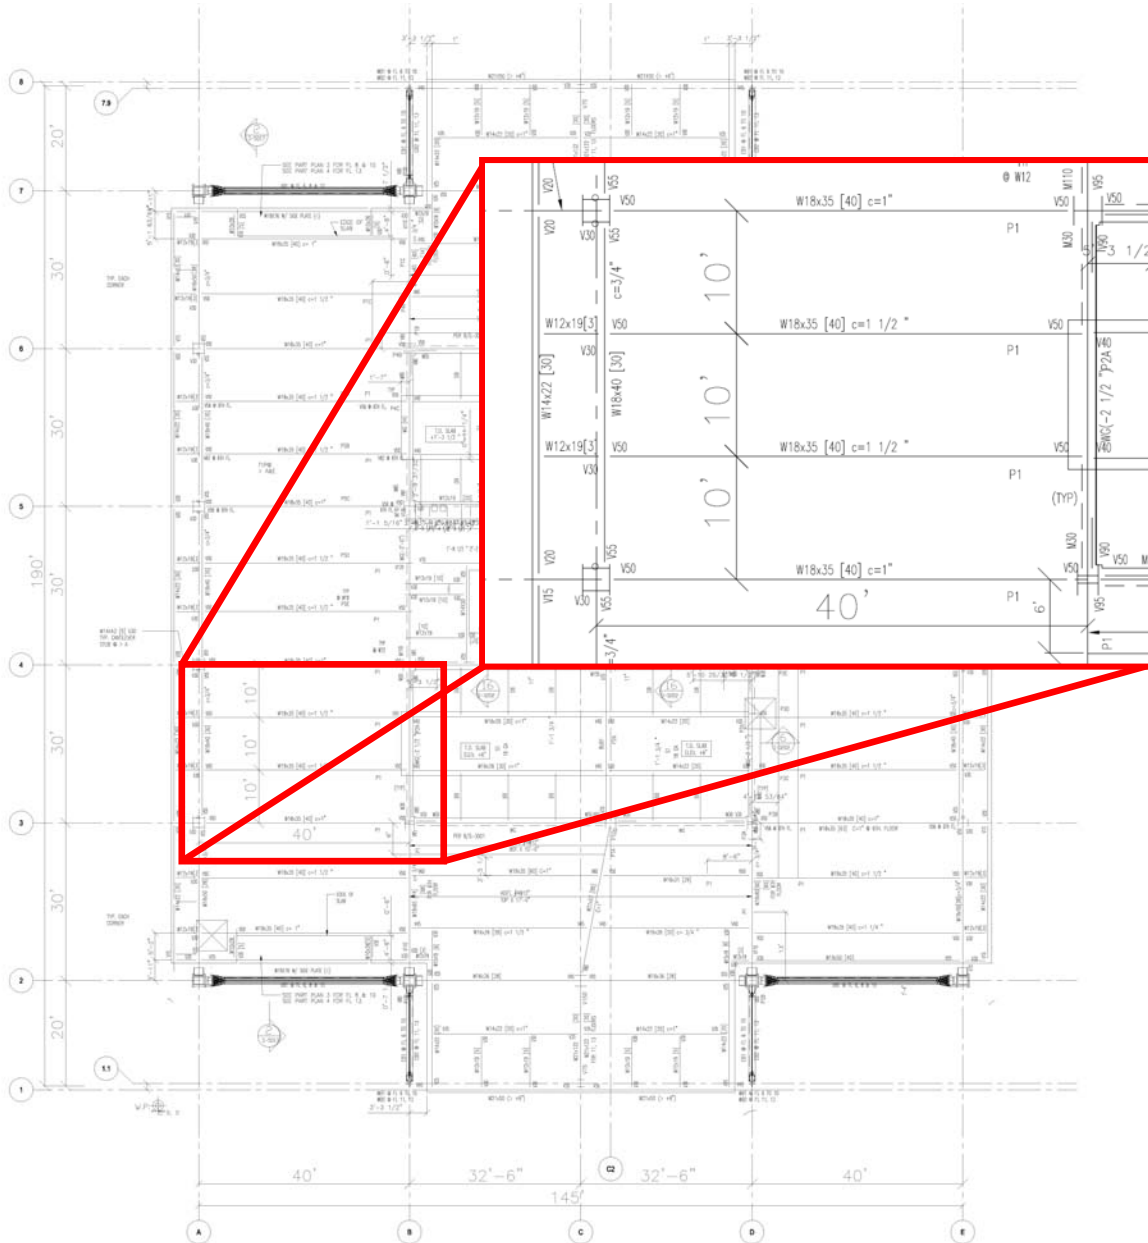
Typical 30'-0" x 40'-0" interior bay used
